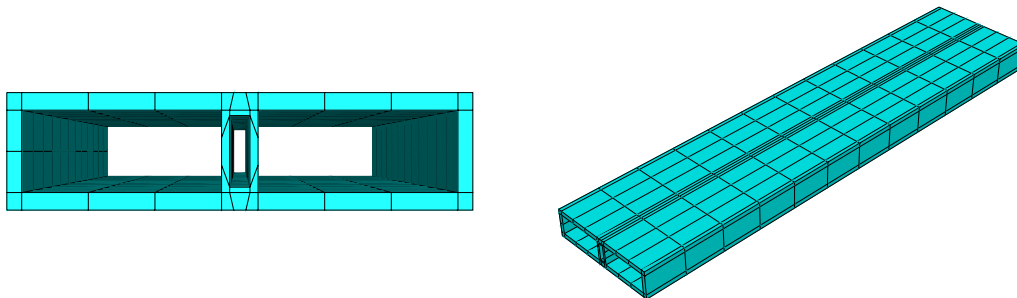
The meshed tunnel element: Cross section (left); isometric view (right).
